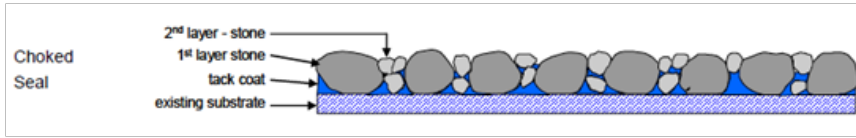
Choked type chip sealed road pavement cross-section (SANRAL 2007)
